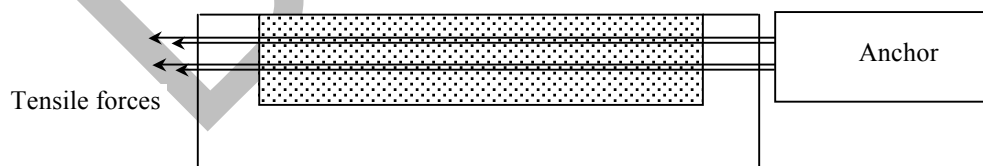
A pre-tensioned pre-stressed concrete set up. The concrete is cast over the tensioned rods. Release of these will place the concrete in compression.
